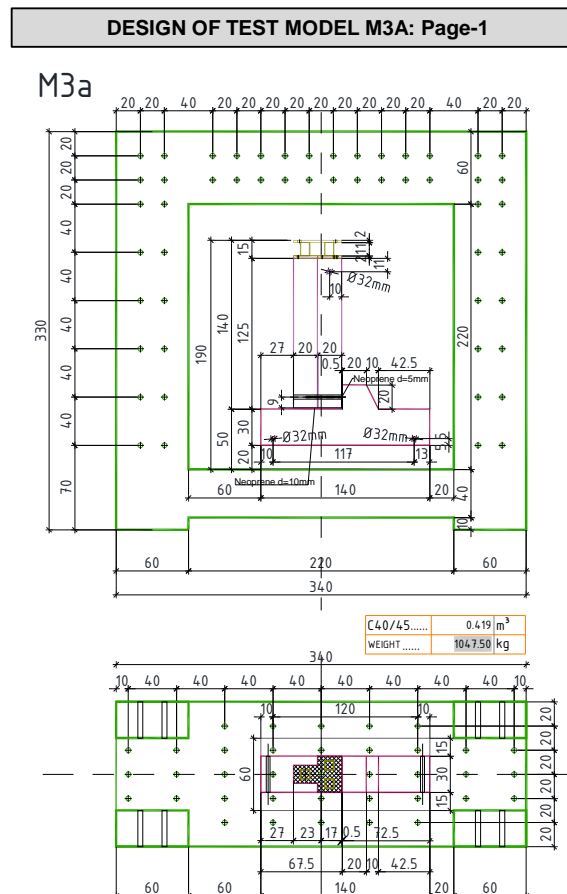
Design of the prototype of model-M3A representing a connection between a precast RC floor beam and an RC column: Set-up of the test model.
